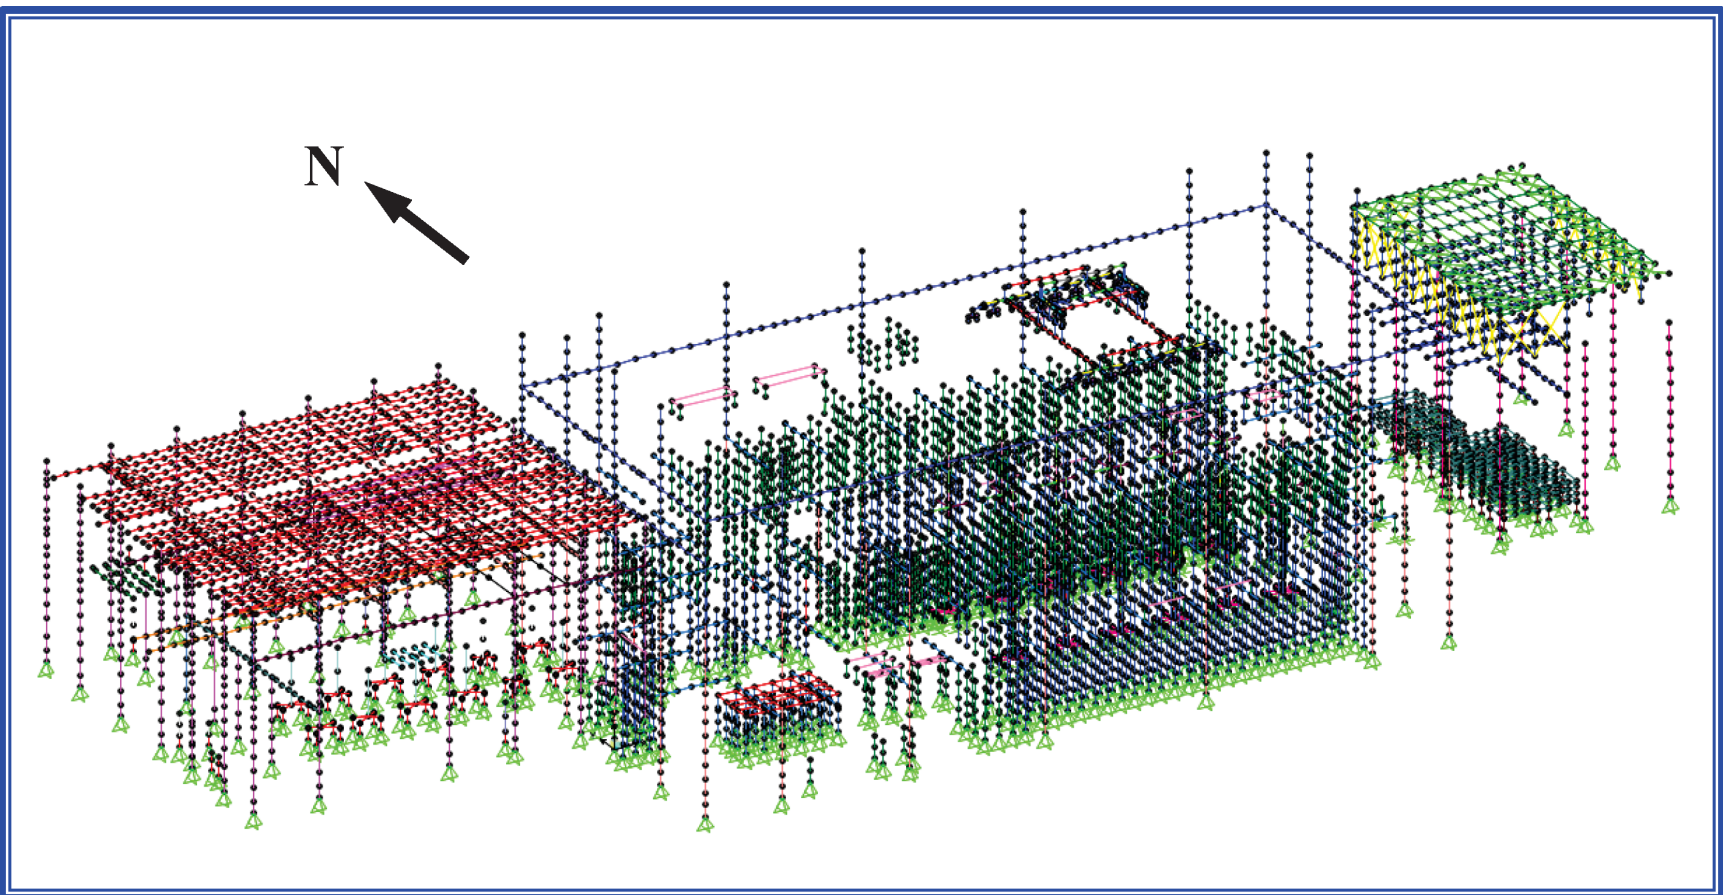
Beam Elements of Triple Building SAP2000 Model
